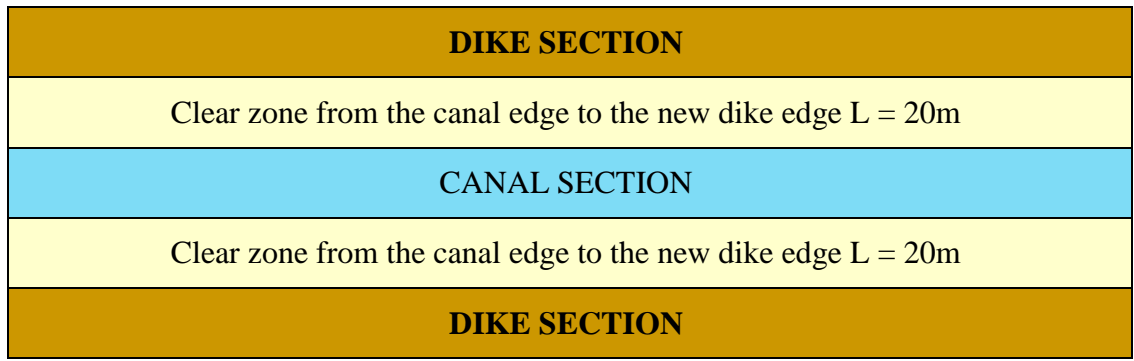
Layout of the dike embankment section of Vinh Loc, Vinh Loi and Vinh Hau canals
